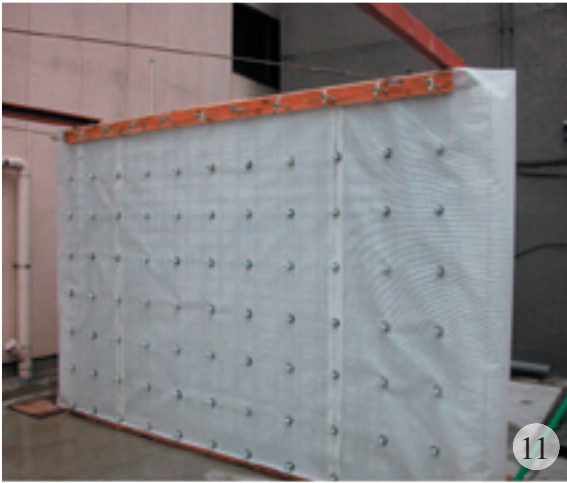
shows formwork for a 'quilt-point' wall. In this application the wall's reinforcing steel is used to hold up the formwork membrane, so no vertical framing members are needed. The only 'framing' required are the lateral support braces attached to the top of the wall form. A grided pattern of form-ties restrains the fabric formwork membrane. These ties are provided with large washers to distribute the stresses imposed on the fabric. It will be appreciated that while more form-ties are used than in a conventional wall of this size, this is an extraordinarily light wall-form consuming very little construction material.
